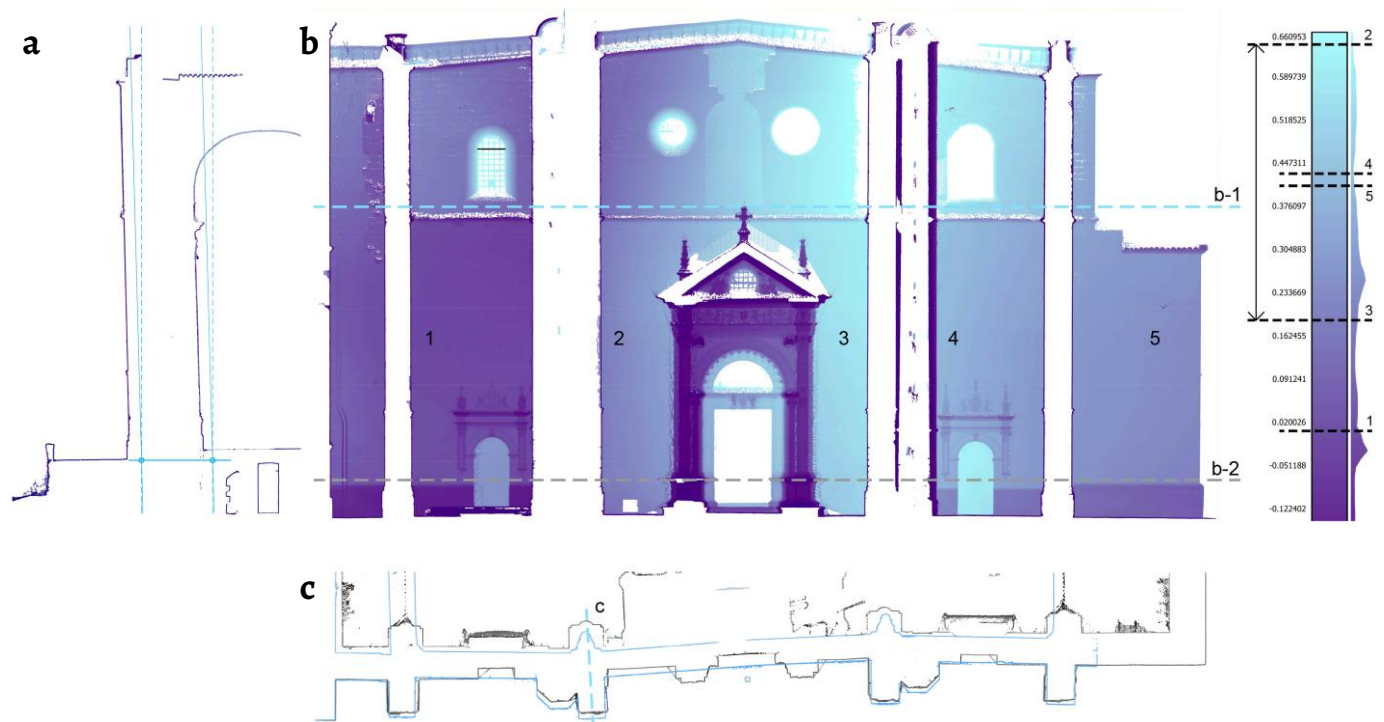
Facade views: a) elevation with deviations of the facade wall surfaces with respect to a selected plane; b) horizontal cross-sections of the facade at different heights; c) cross-section through a buttress.
